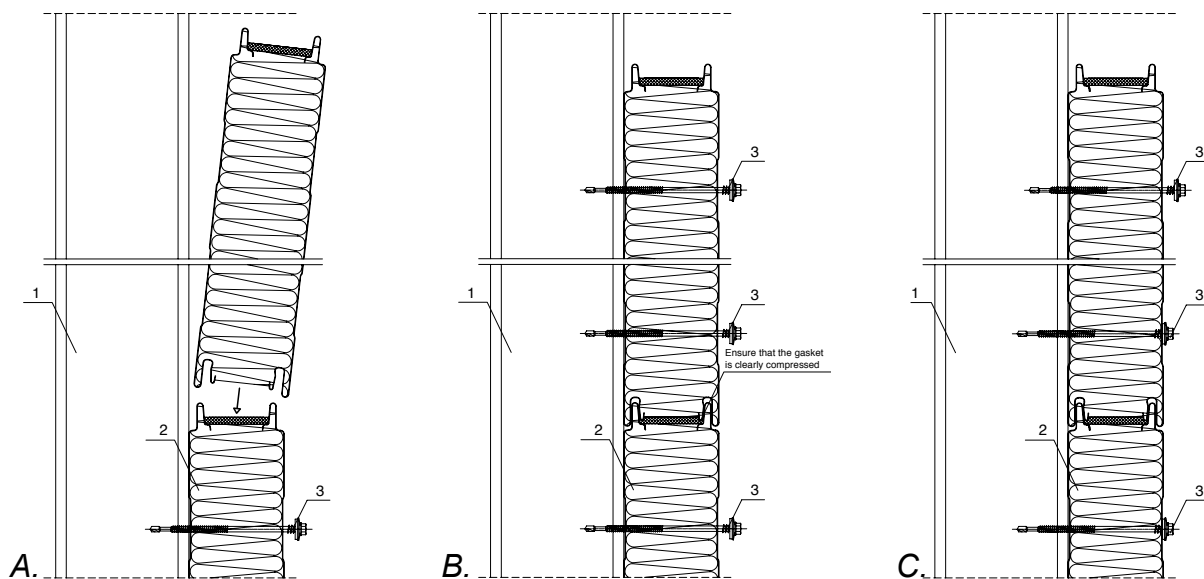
Sample assembly of sandwich panels in horizontal arrangement, where:
